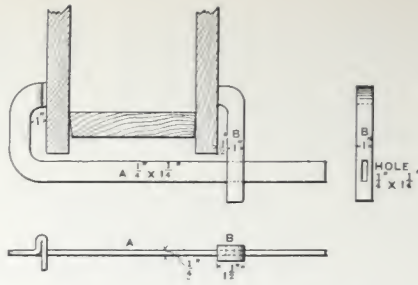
Clamp for Beam of Small Column Form. (Reproduced by permission from Taylor and Thompson's "Concrete, Plain and Reinforced.")
